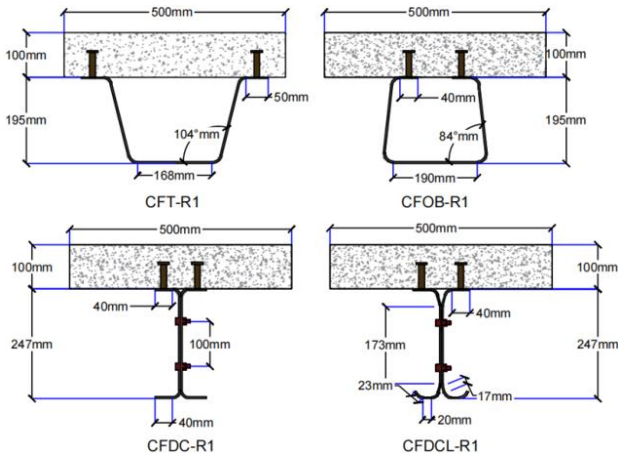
Shapes and dimensions of the cold-formed steel concrete girders ($t = 3.7 \text{ mm}$)
